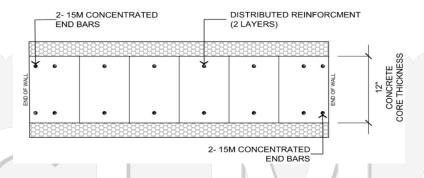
3. Walkout Basement Wall of a Two-Story Building with Main Floor ICF Walls Supporting Second Story Wood Framed Walls, Floor and Roof (TYPE W3).
